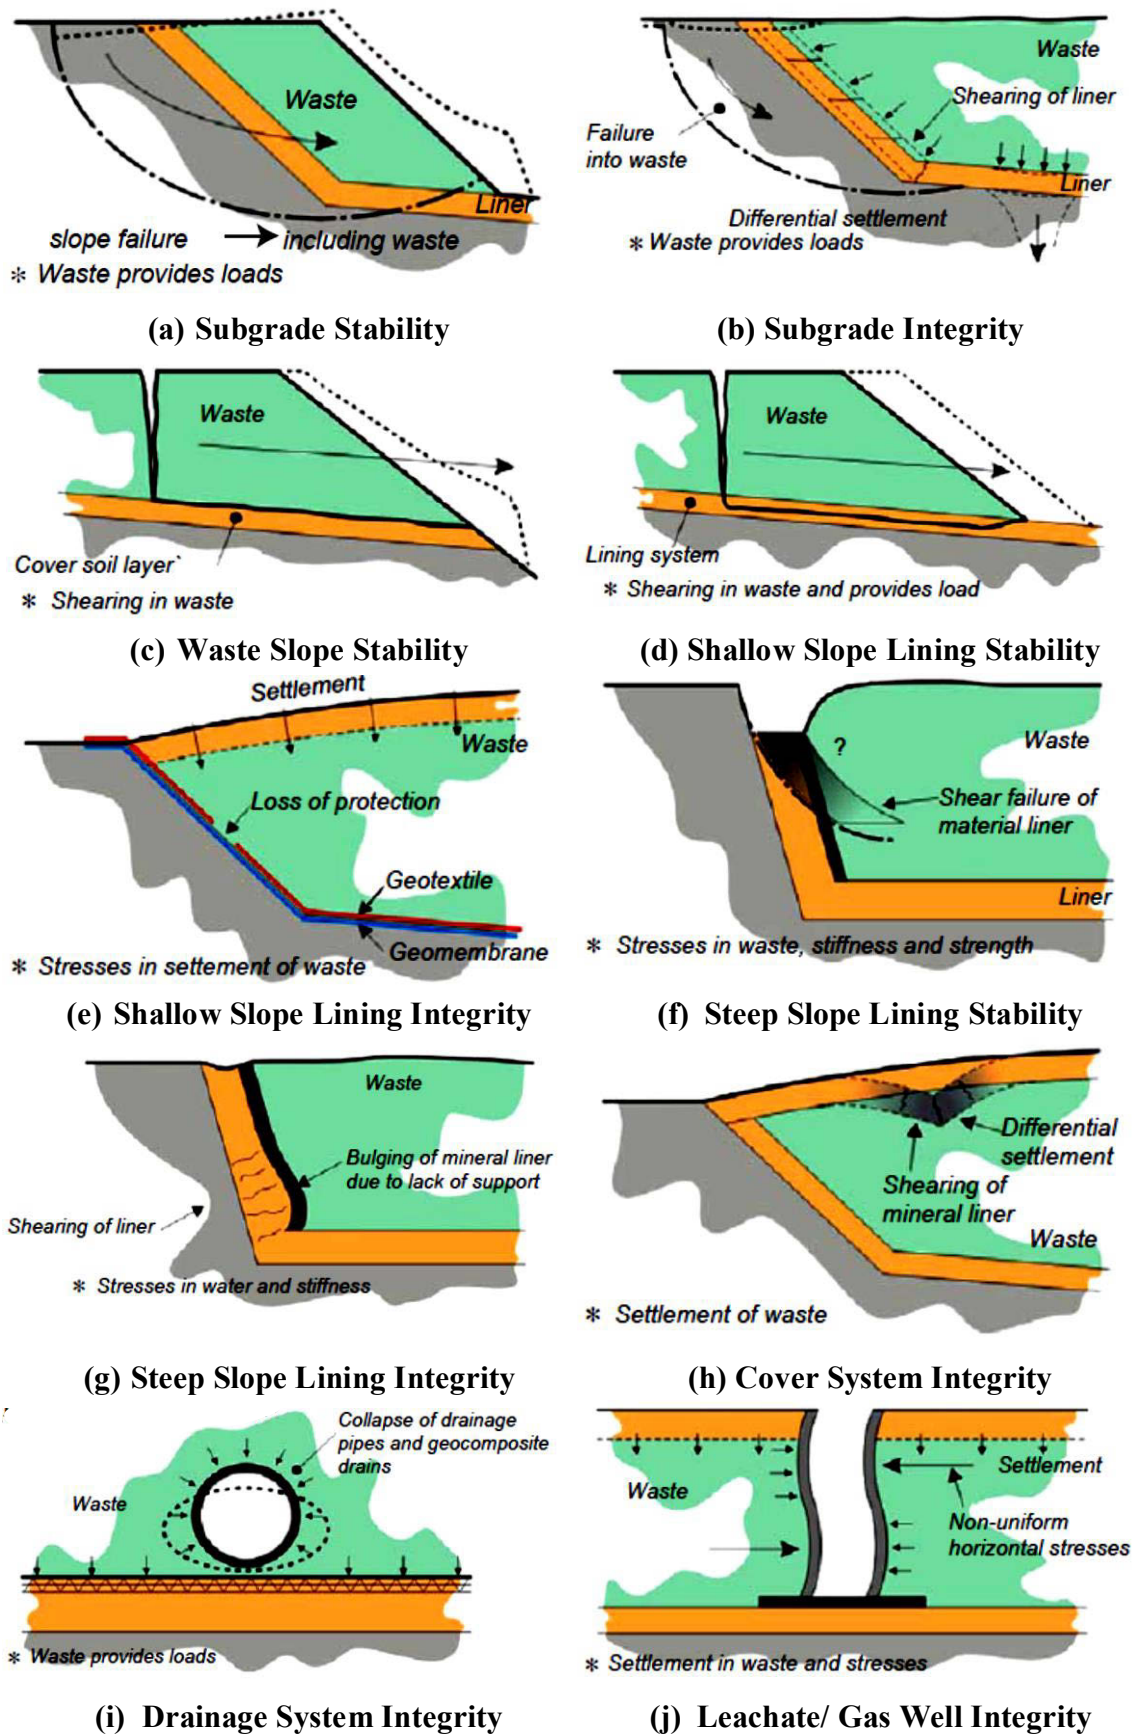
Potential Modes of Failure in Landfills (Dixon et al., 2008)
